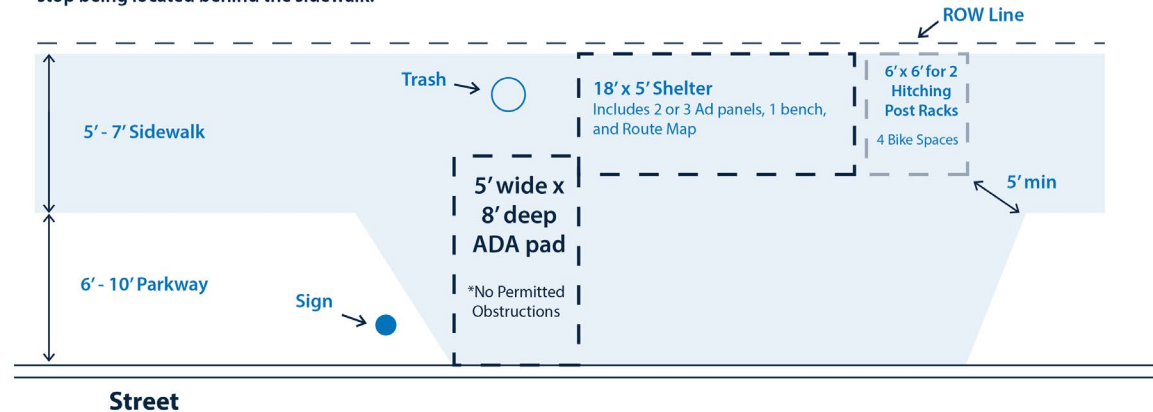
Type III Constrained (Detached Sidewalk) – Amenity Detail
